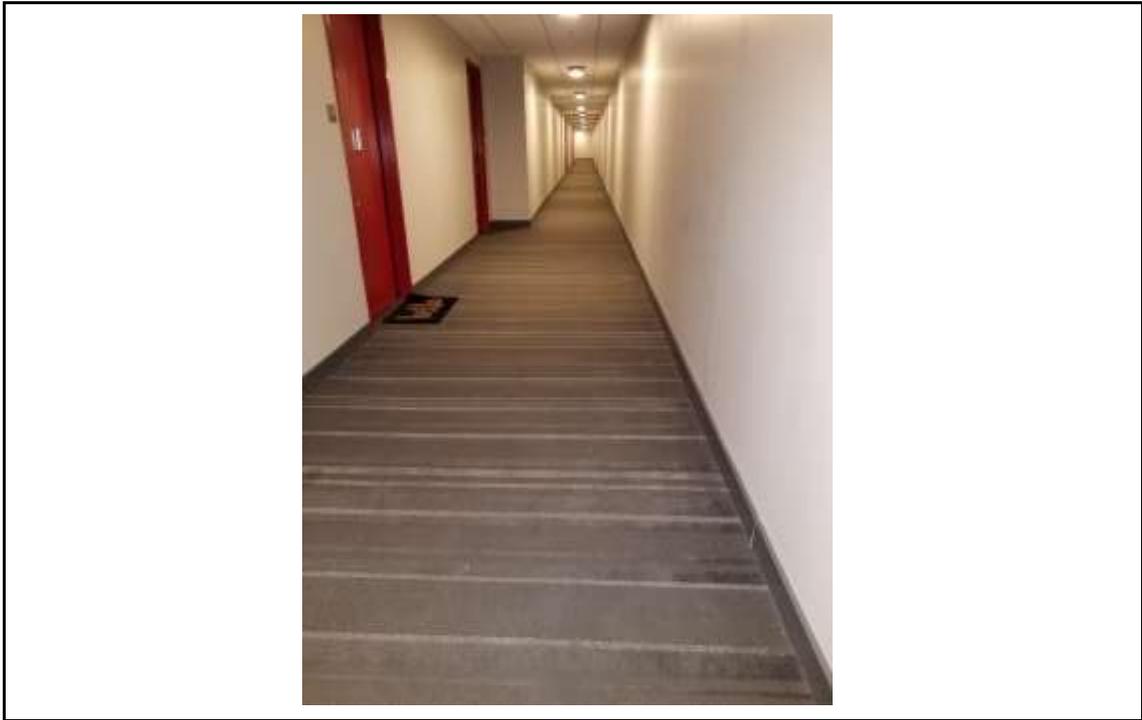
First floor concrete slab covered with carpet, facing northwest. 20 June 2022.
